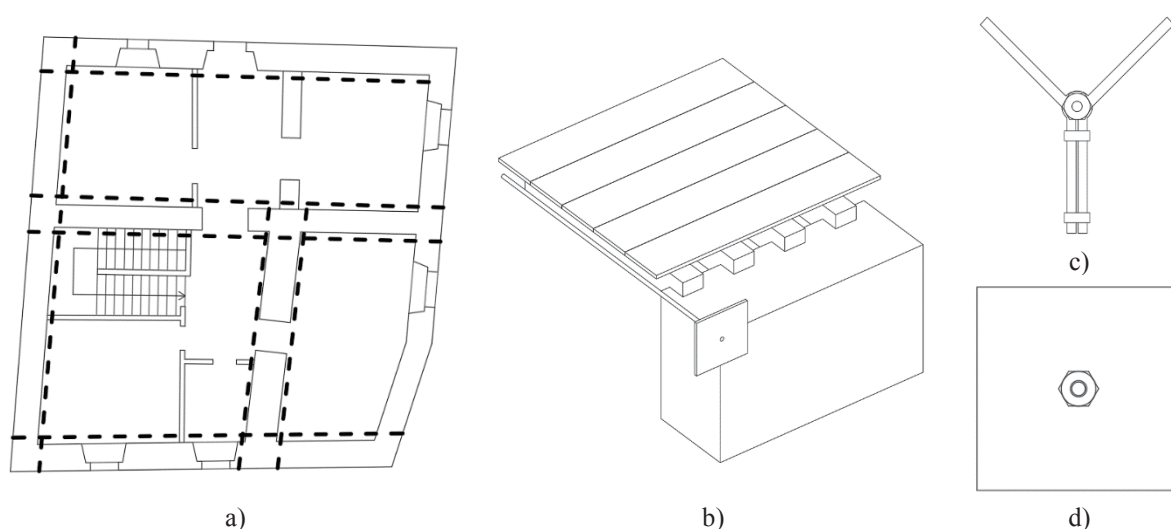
Ties positioning (a, b) and examples of external anchors (c, d).
